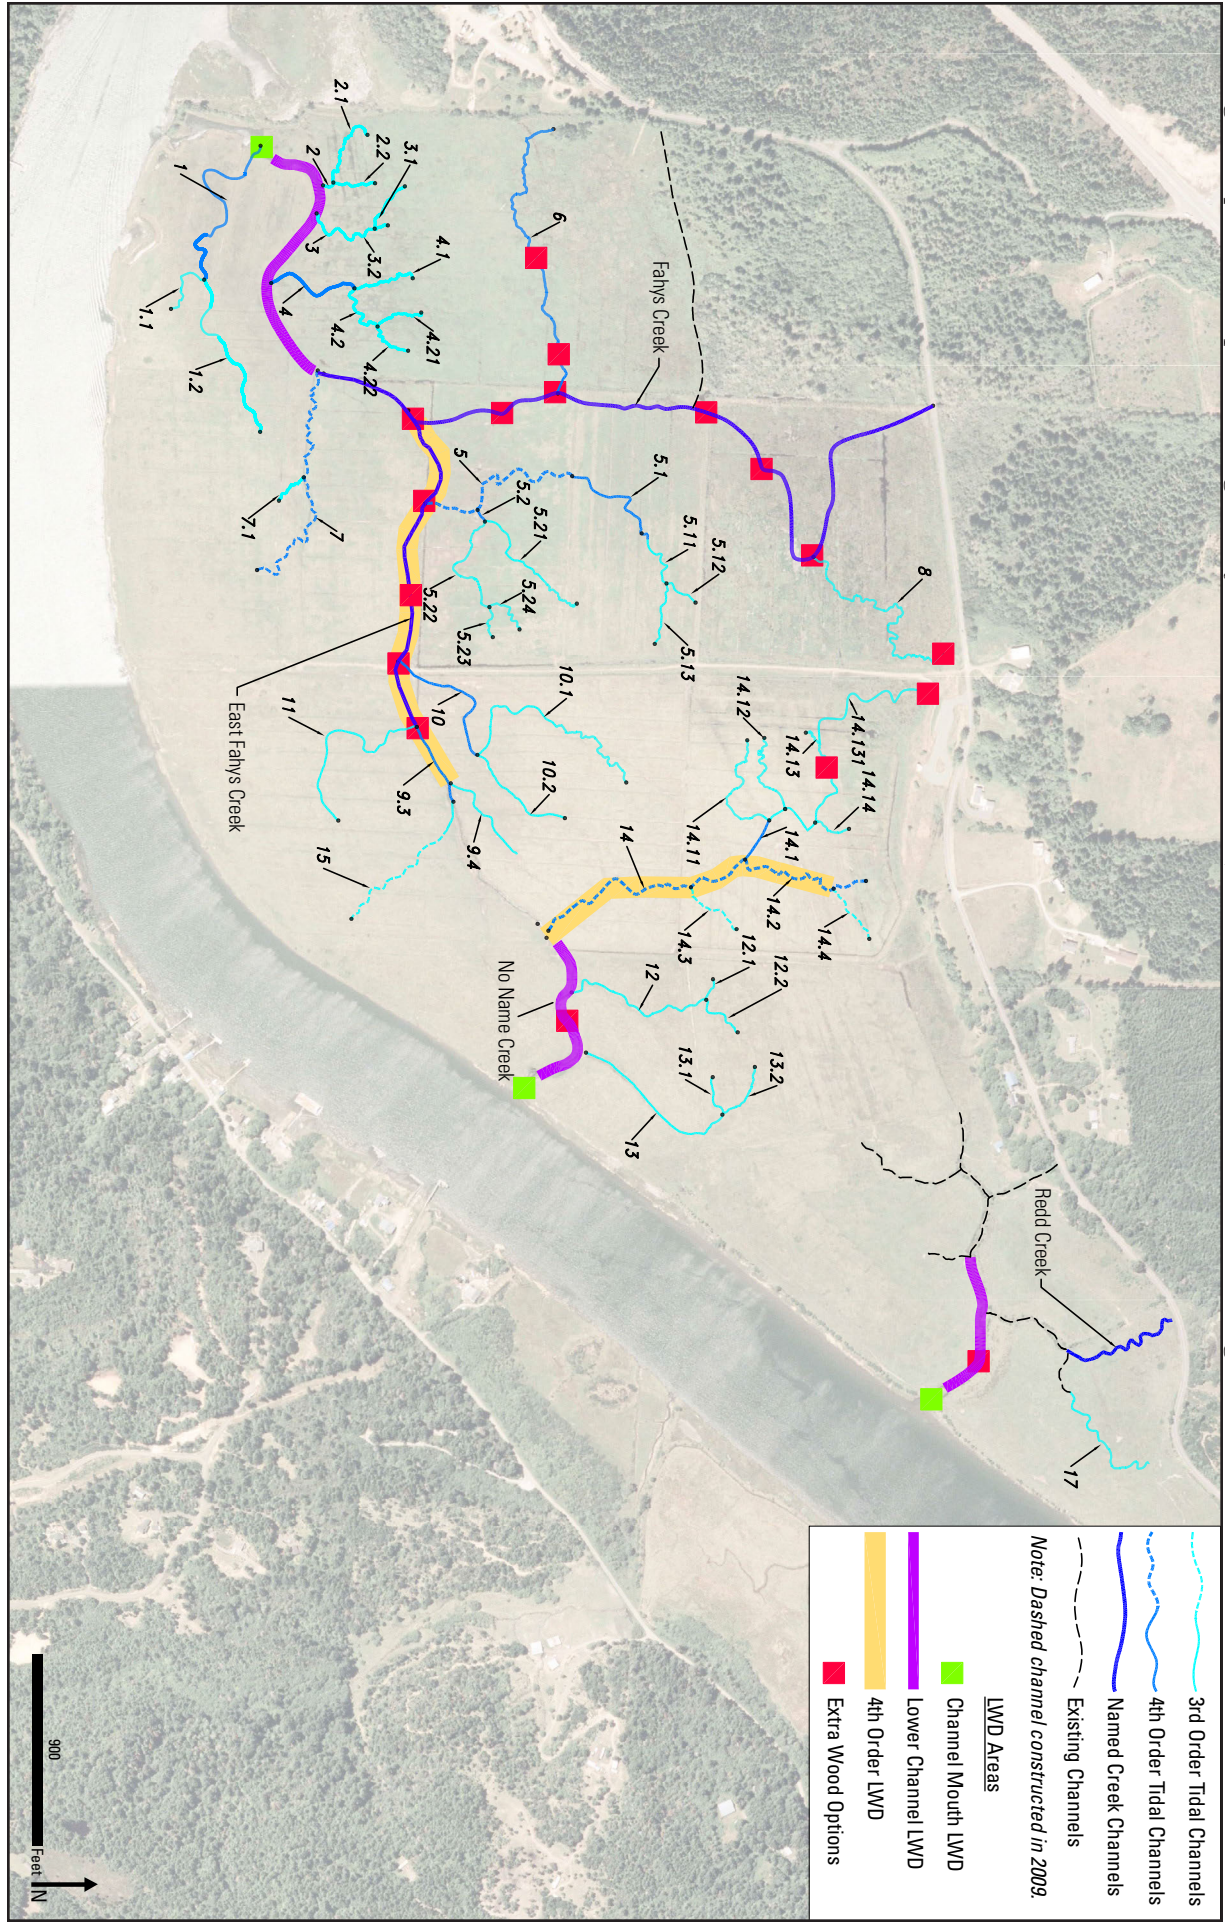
Overview of the final restoration construction plan by Ducks Unlimited
